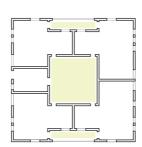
Schematic floorplan of the proposed courtyard typology.
